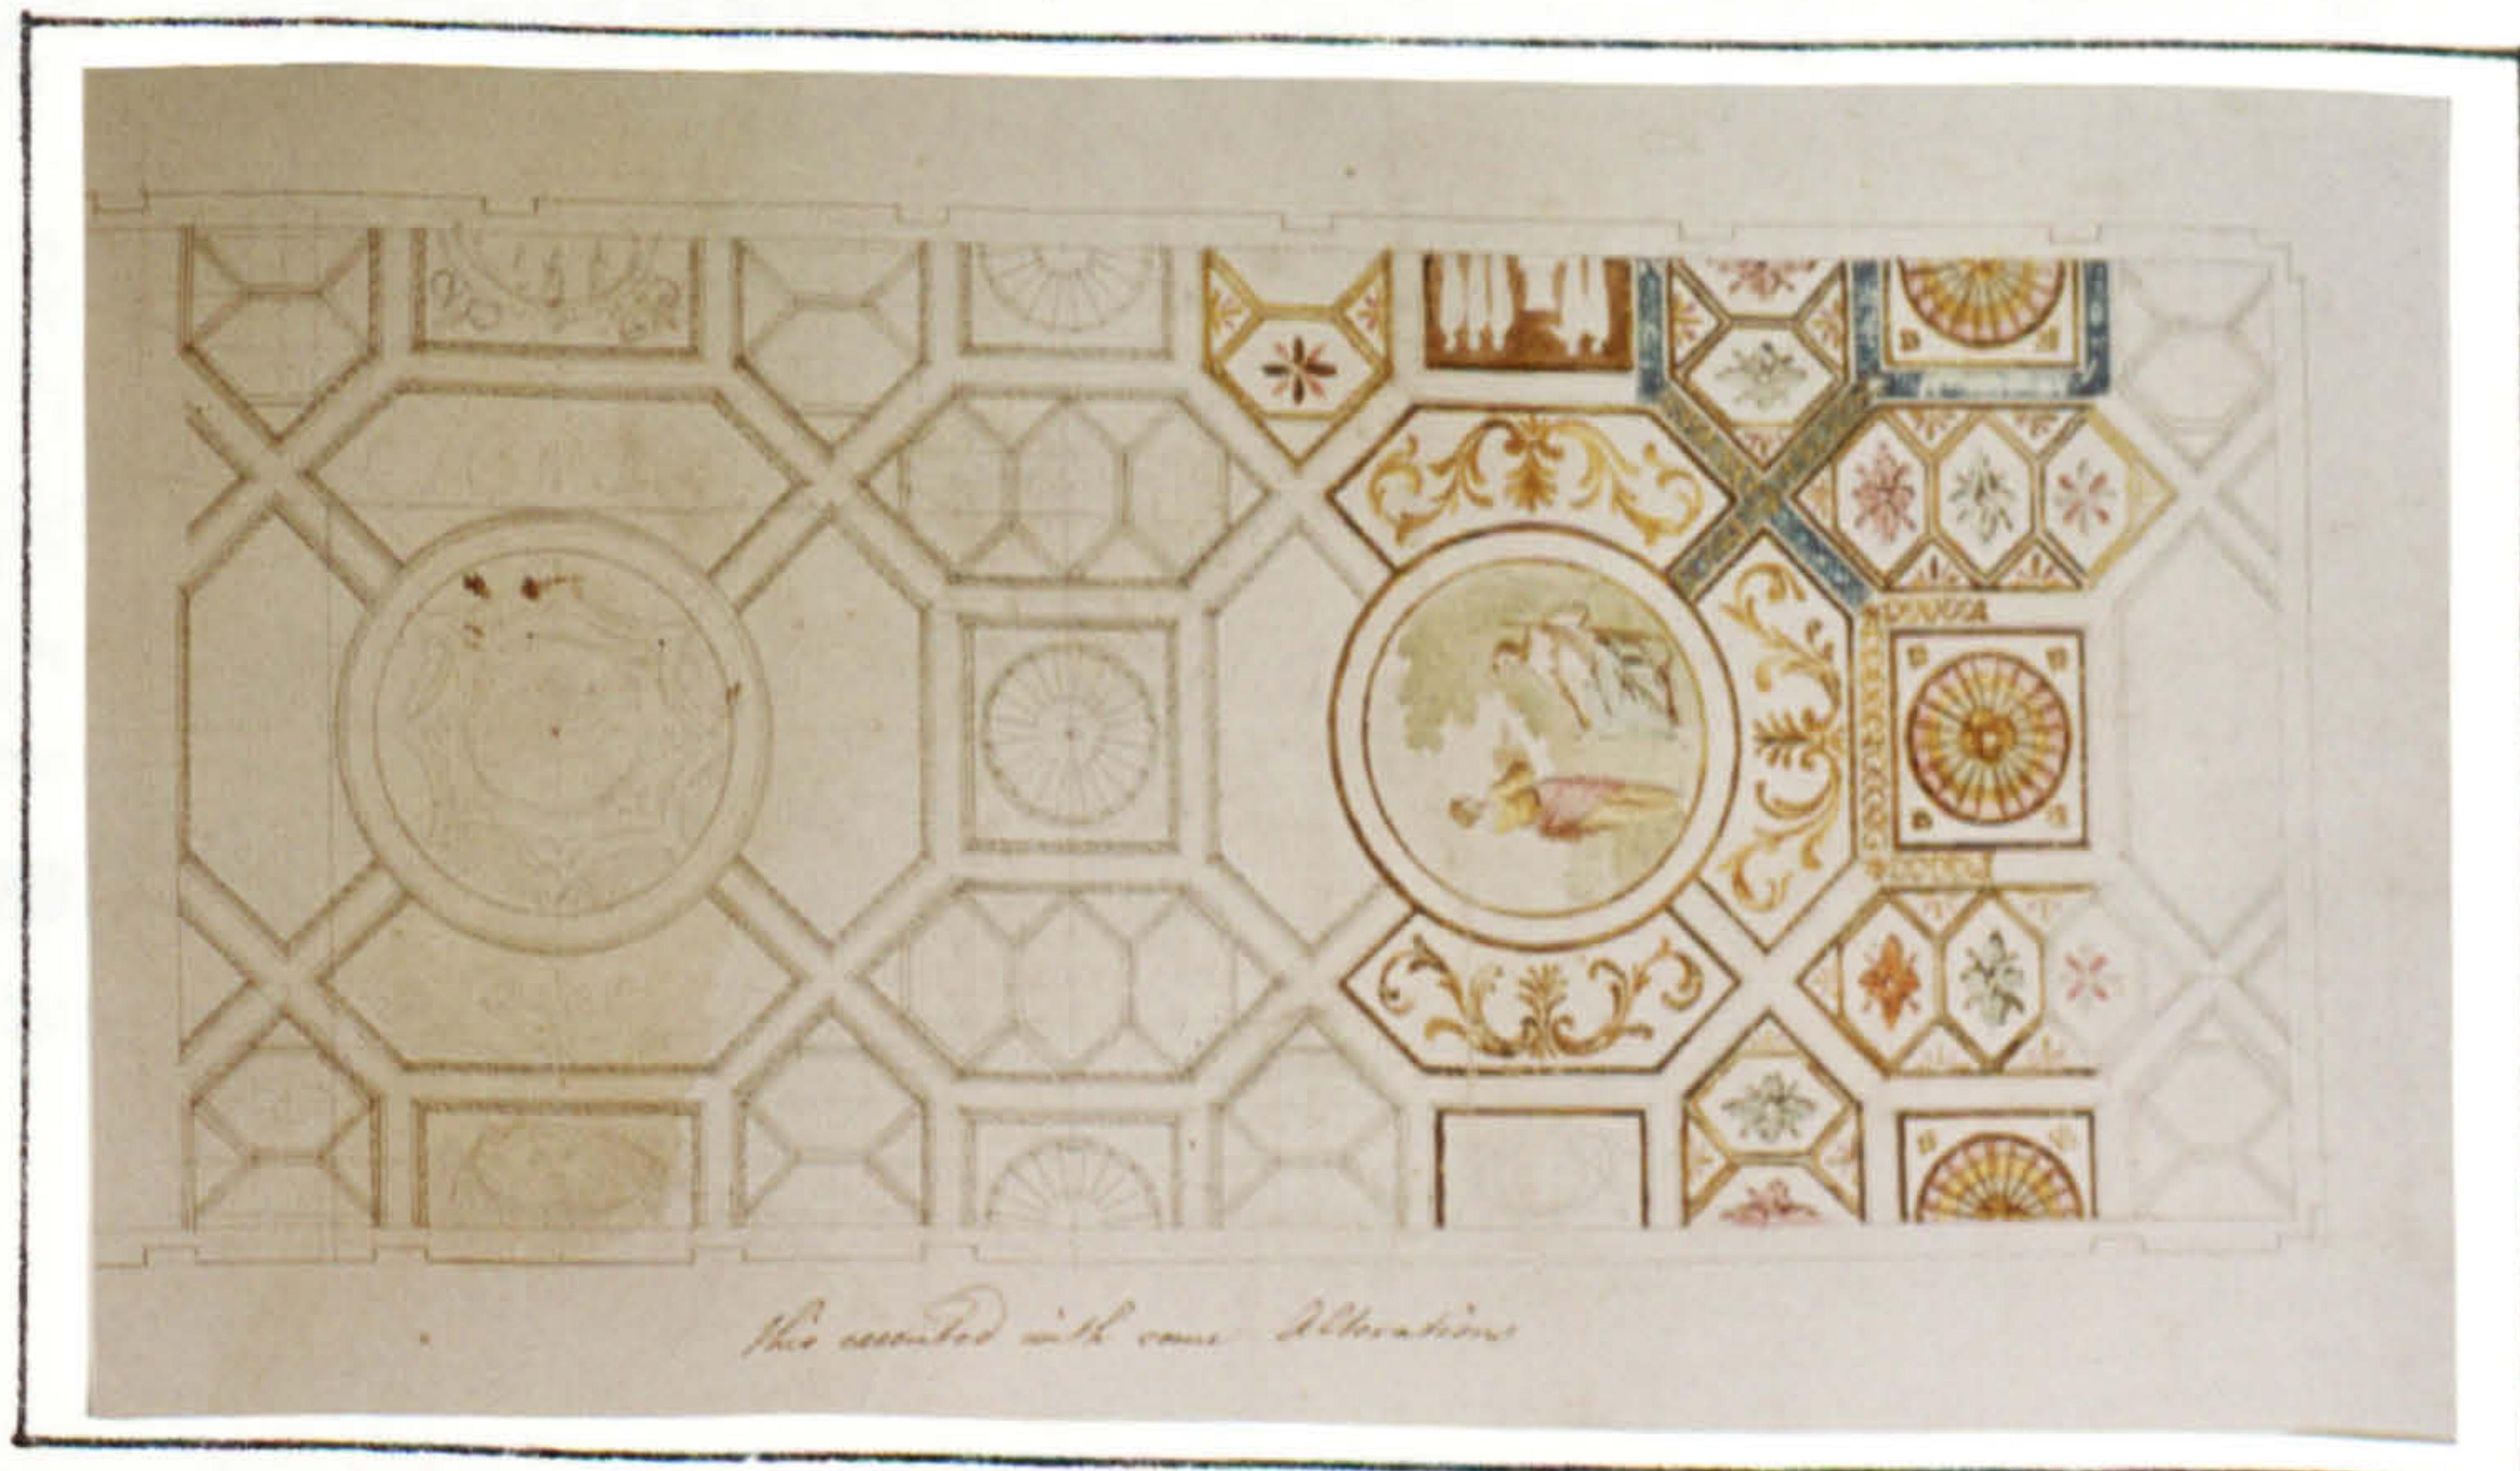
ROBERT ADAM · DESIGN FOR THE GALLERY CEILING · SYON · 1763
